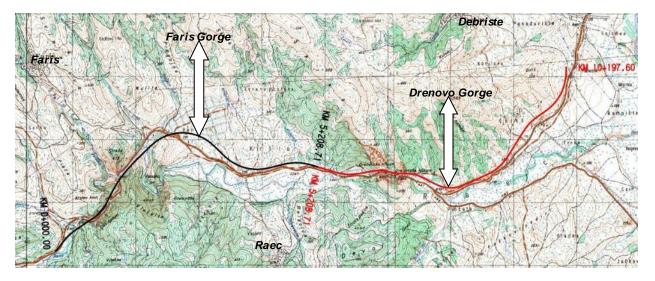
Alignment - Bridge over River Raec - "Drenovo" interchange: sub-sections crossing Faris and Drenovo Gorges
